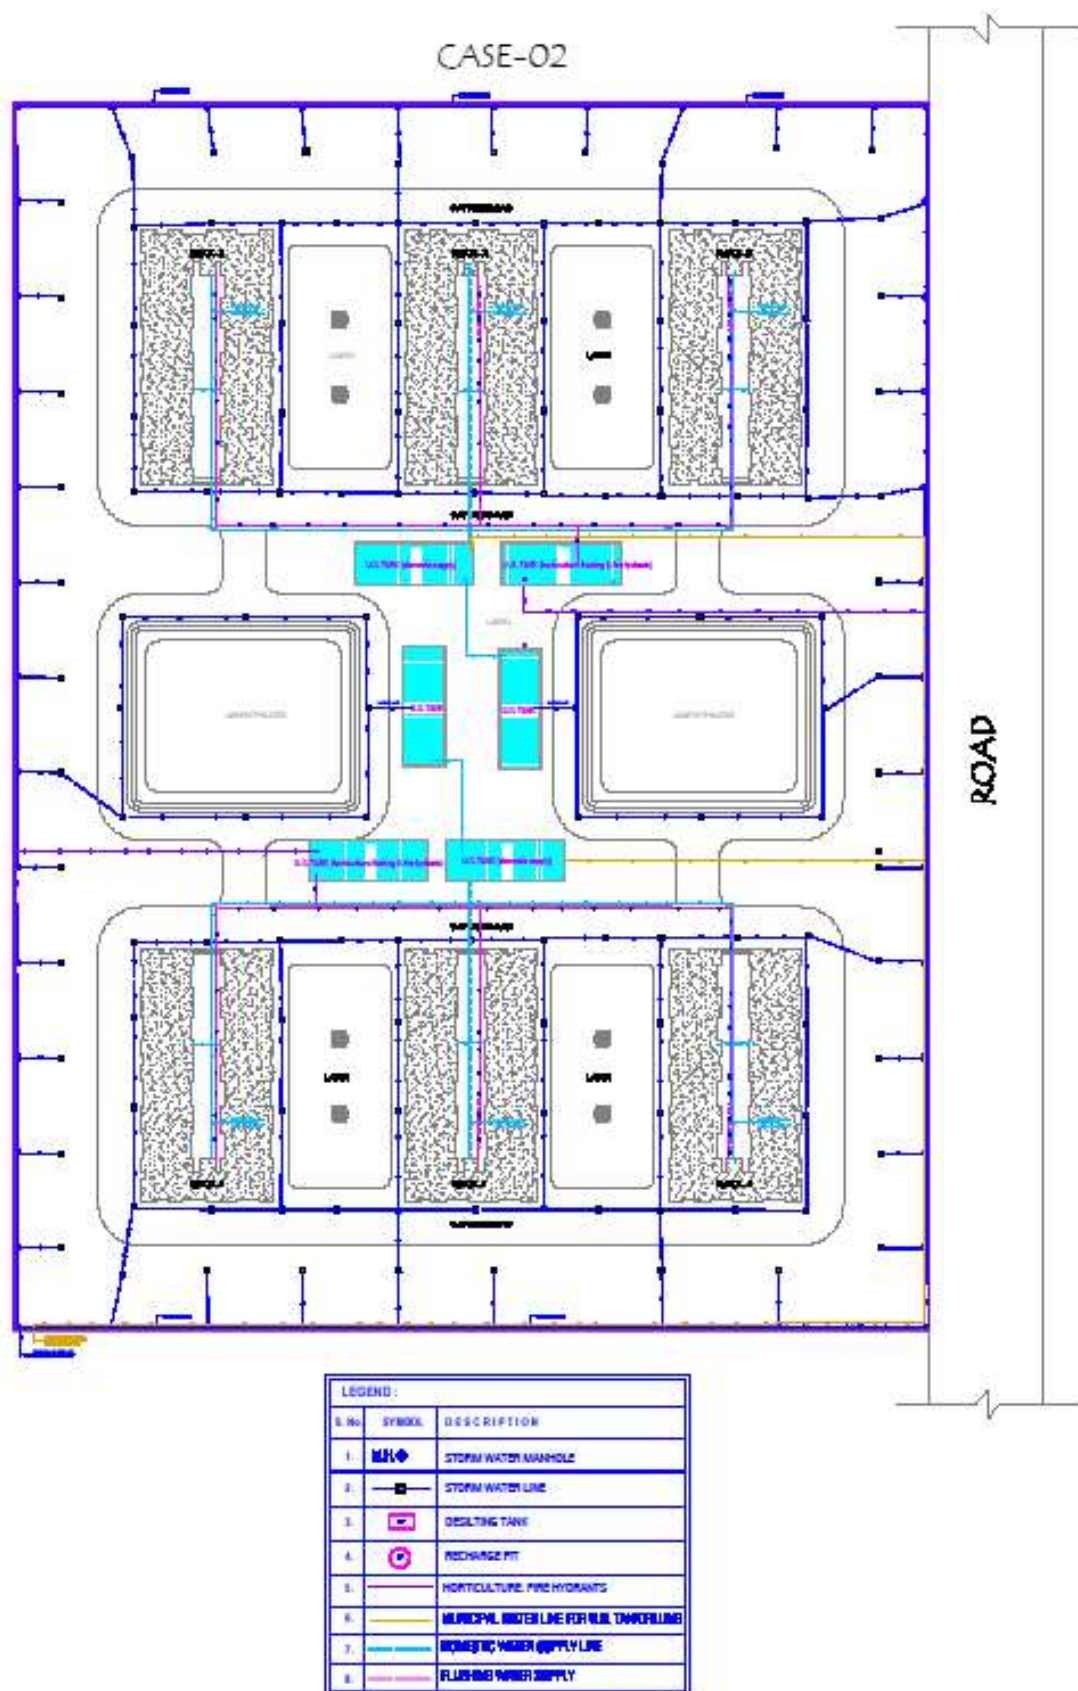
Proposed design case for rainwater harvesting (Author, 2021)
